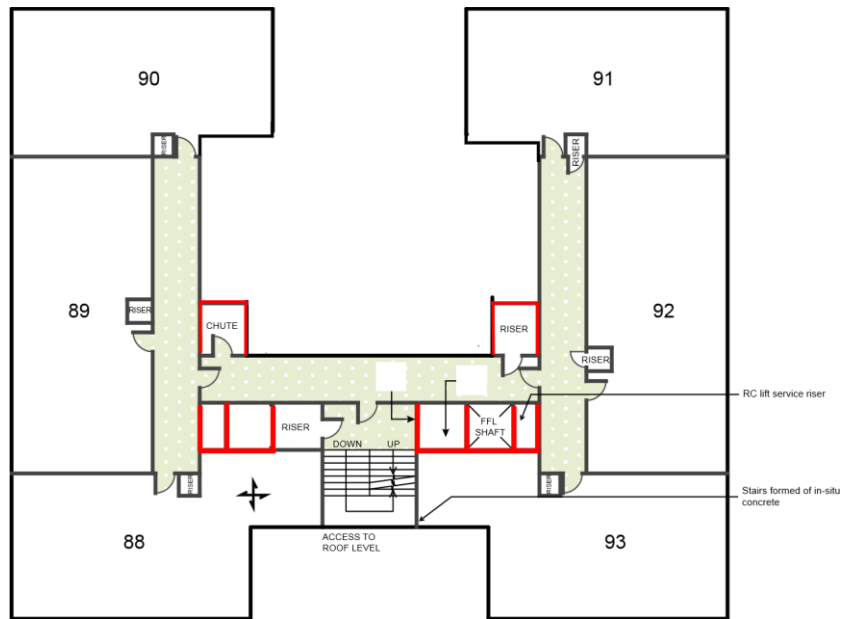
Diagram of typical upper floor structure Table 4 Below is a summary table of the key structural elements
